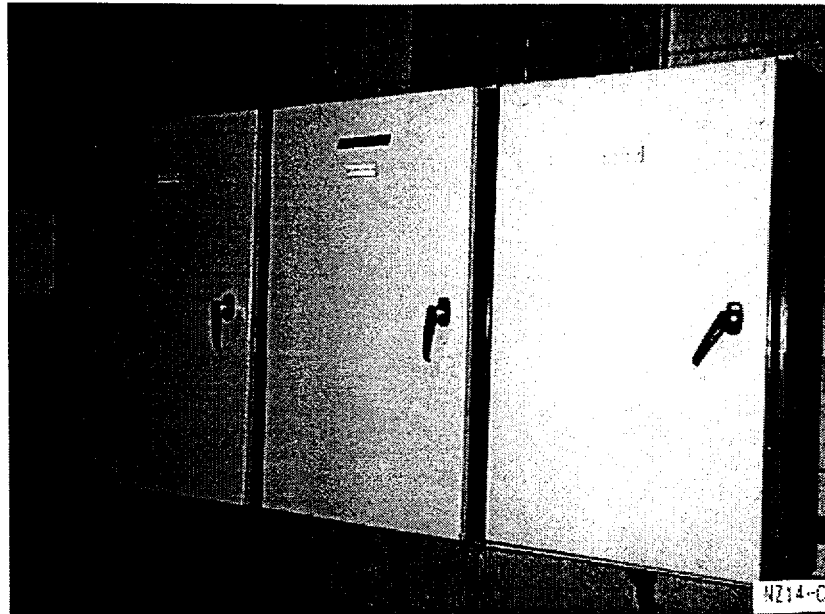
Wall-mounted panelboards exceeding the standard dimensions of width also create a question of excessive mass cantilevered from their supporting wall anchorage. Examples of wall-mounted panelboards exceeding 40 inches in width (~ 72") include double and triple panelboards combined as single wall-mounted cabinets at the Caxton Paper Mill, which withstood by the 1987 earthquake in New Zealand, PGA= 0.40g.
